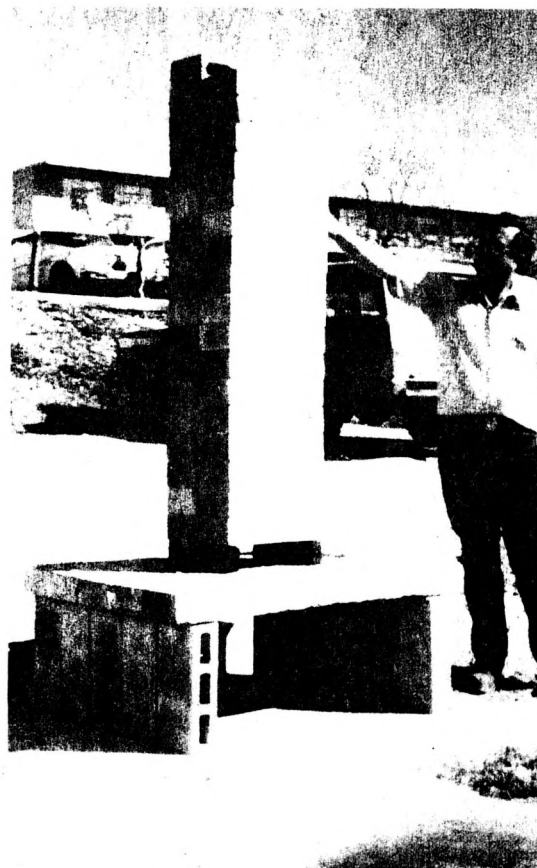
TOTALLY COATED WALL TESTED AS A BEAM
